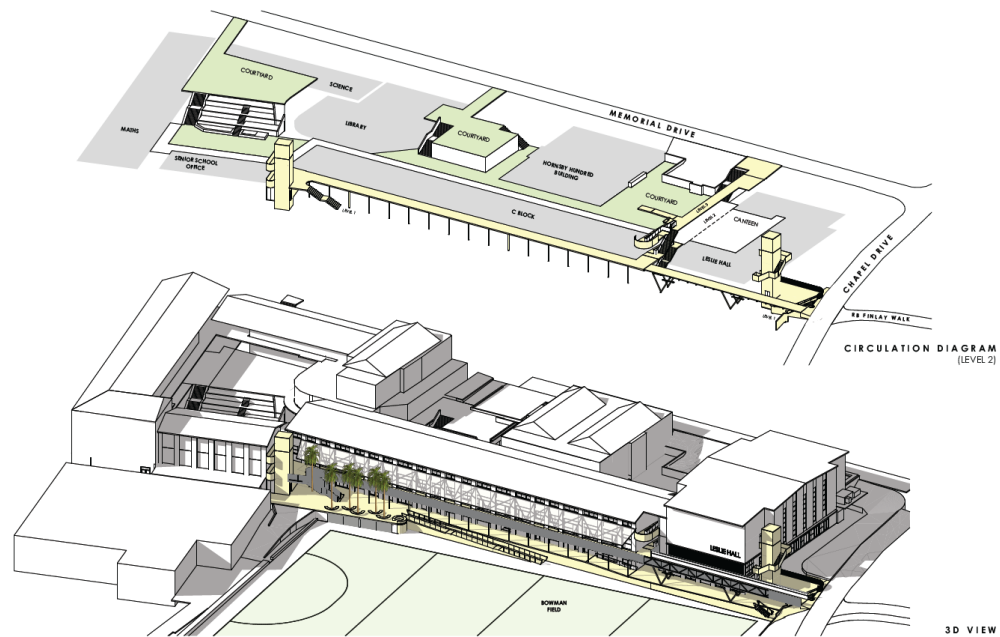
Proposed perspective of the C-Block Elevated Walkway. (Source: Neeson Murcutt + Neille)
